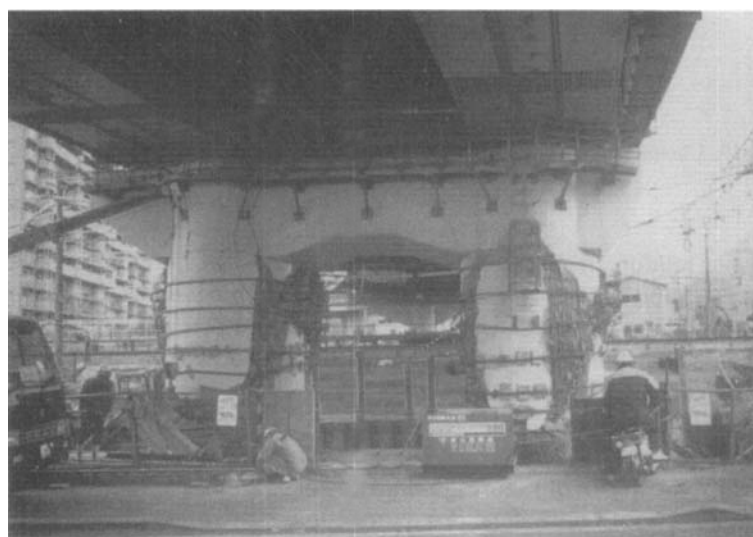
Compressive failure of squat piers of Second Shinmeyer Overbridge. Photograph used with kind permission of Professor Chitoshi Miki
